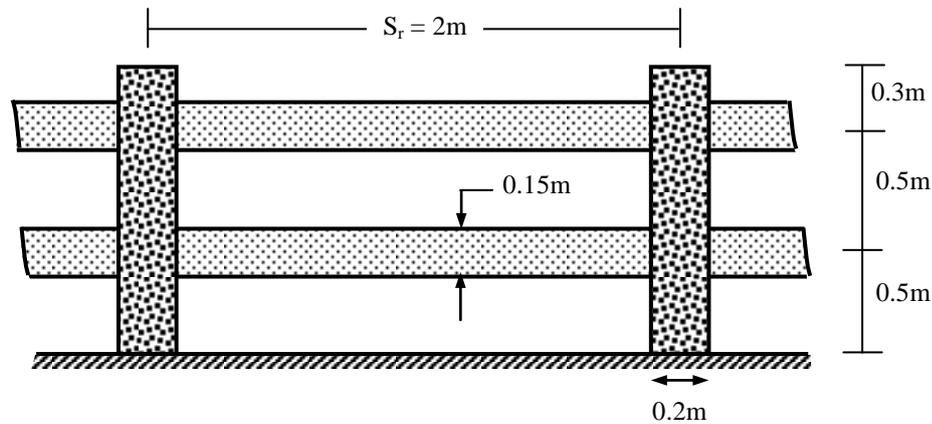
Elevation of RC Railing used in the analyses (showing c/c view only)
